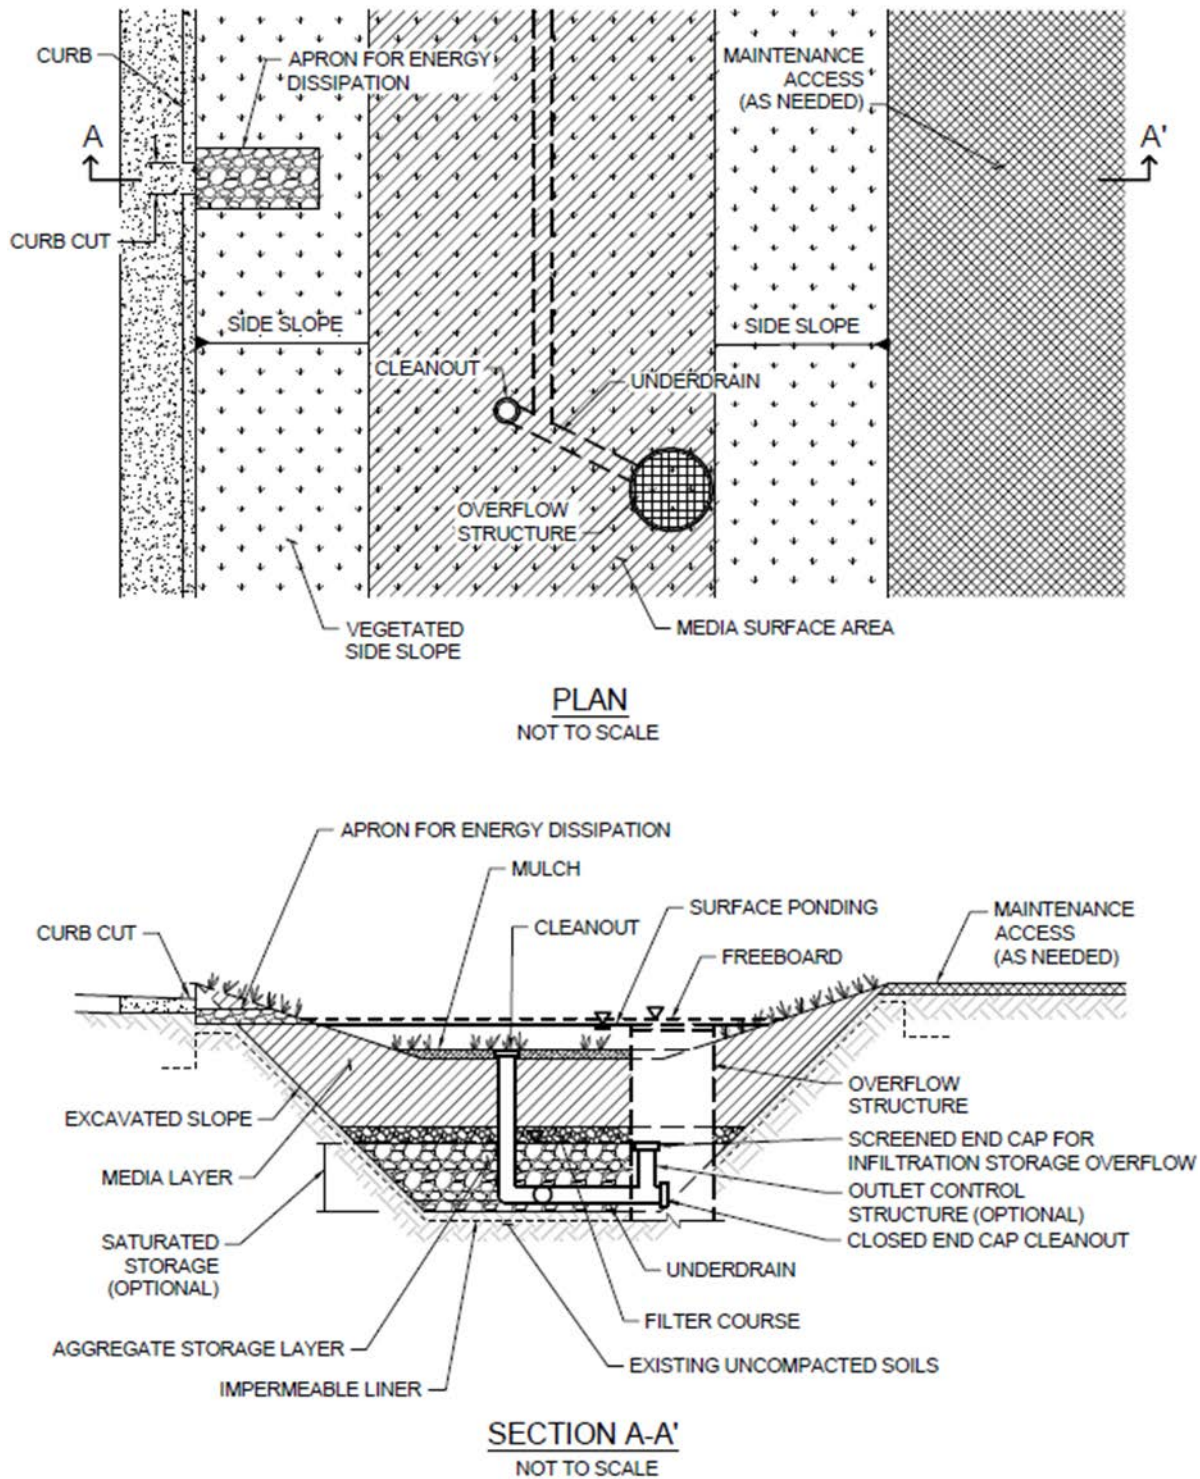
Typical Plan and Section View of a Biofiltration BMP
